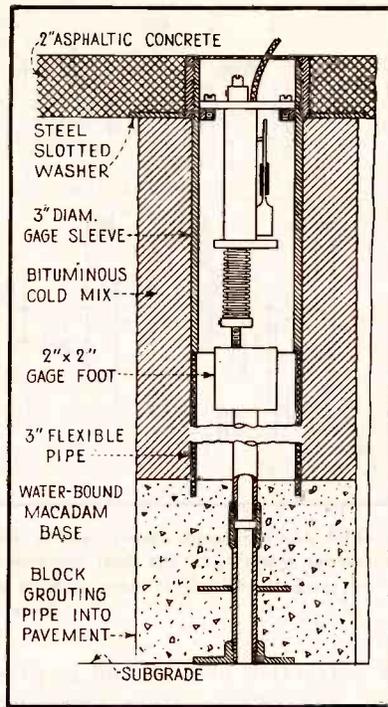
Method of installing the gage illustrated in Fig. 18 in pavement
